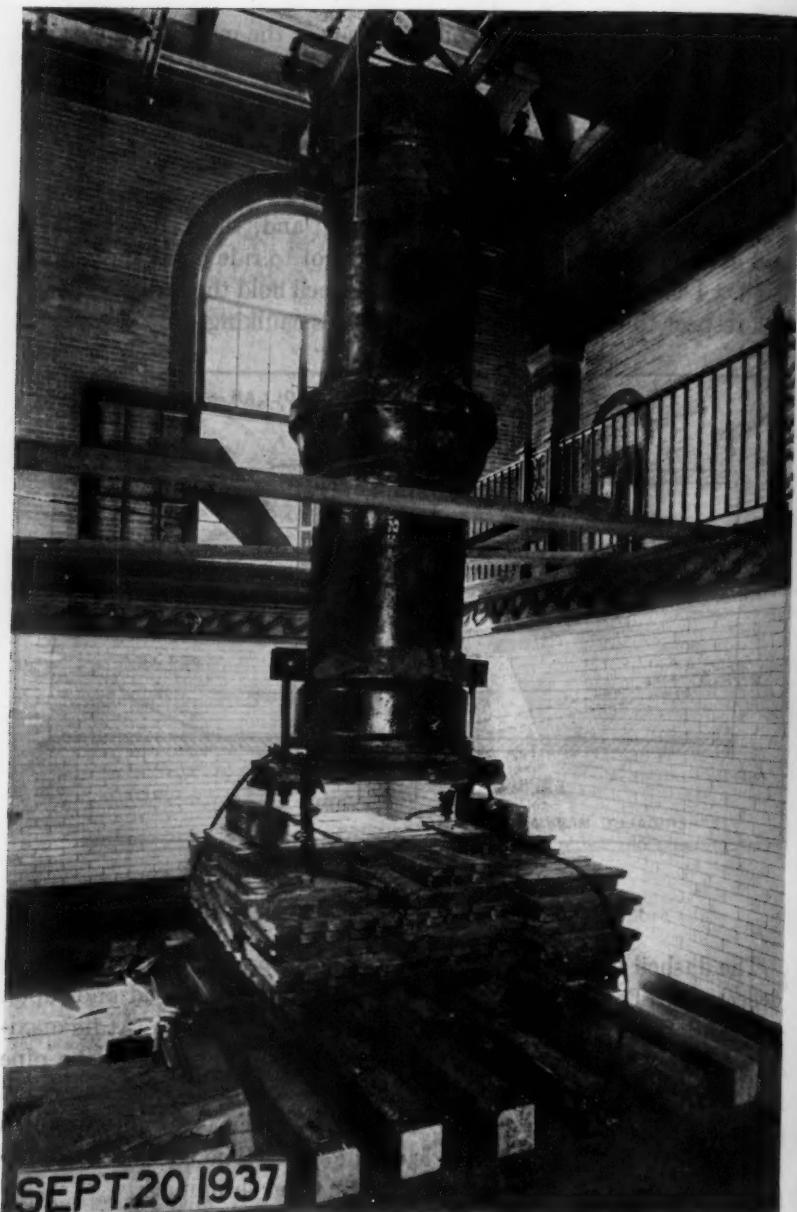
ARRANGEMENT FOR TESTING JOINT STRENGTH
